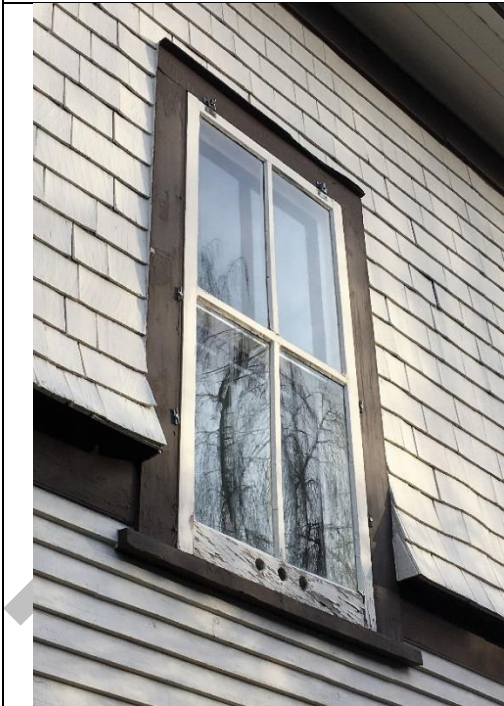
Example of 1-over-1 single hung wood window and 4-light wood storm window
